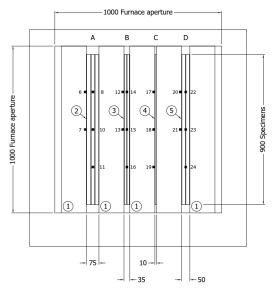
Wall linear gap systems G1-G4 – assessment 2 (as shown in WF 160399) – dimensions in mm
